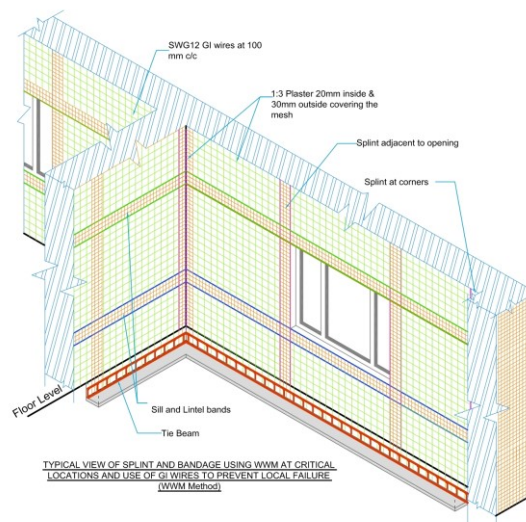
Typical design output of retrofitting for stone masonry wall using WWM Method (© NSET, 2015)
